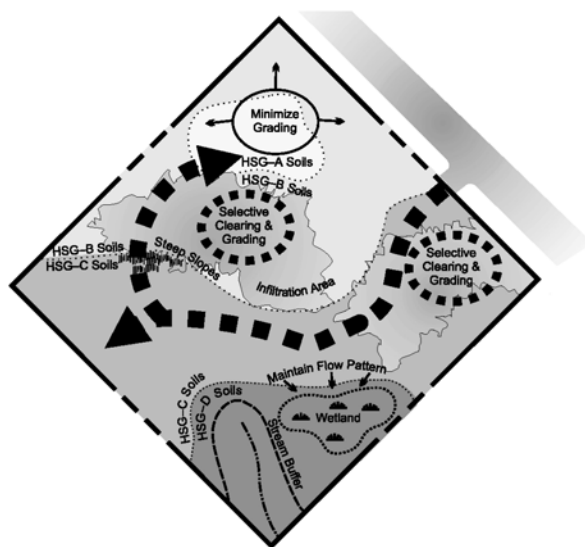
Guiding Development to Less Sensitive Areas of a Site
